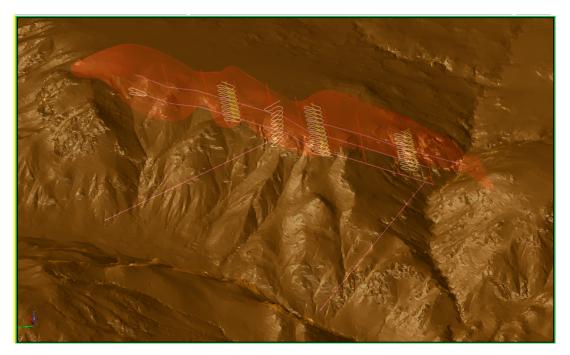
Main access ramps, levels and internal ramps with a schematic view of the Angela Vein (looking southeast)
